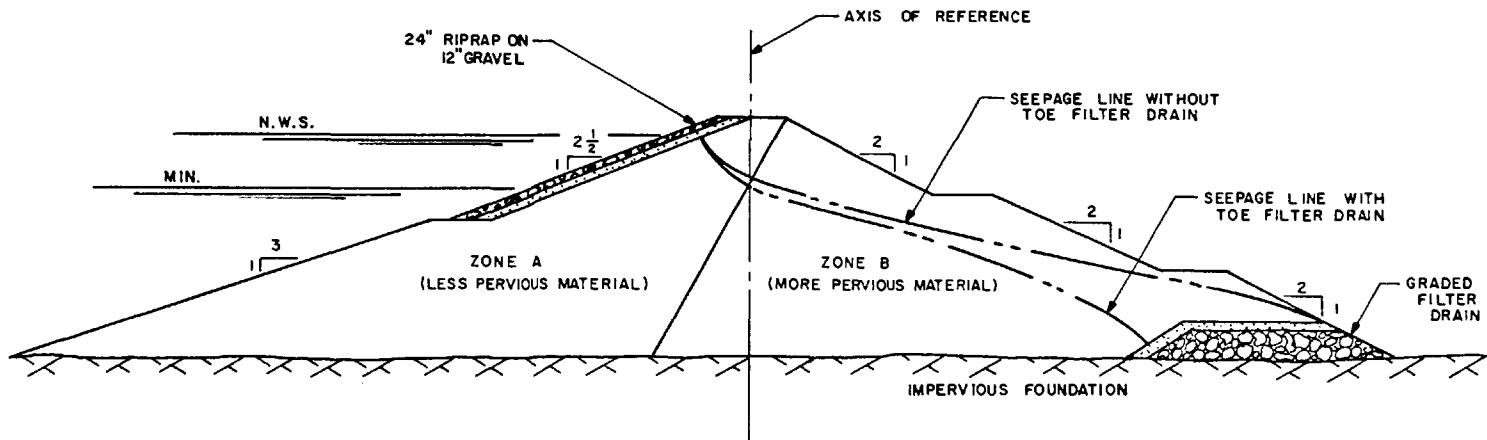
Typical Section of a Rolled Earth-fill Dam Built with Zoned Materials
